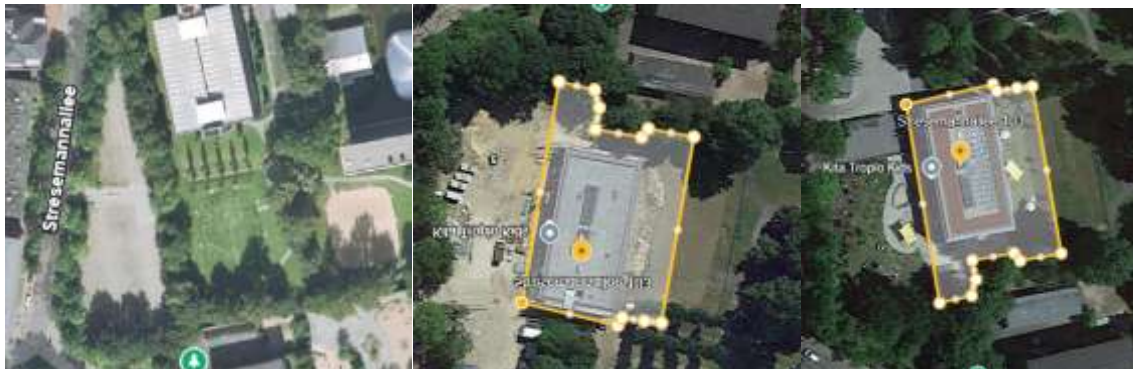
Preconstruction (2008), During Construction (2013) and Post Construction (2015) left to right, respectively of Troplo Kids Daycare Center (HamburgGeoportal, 2025)
